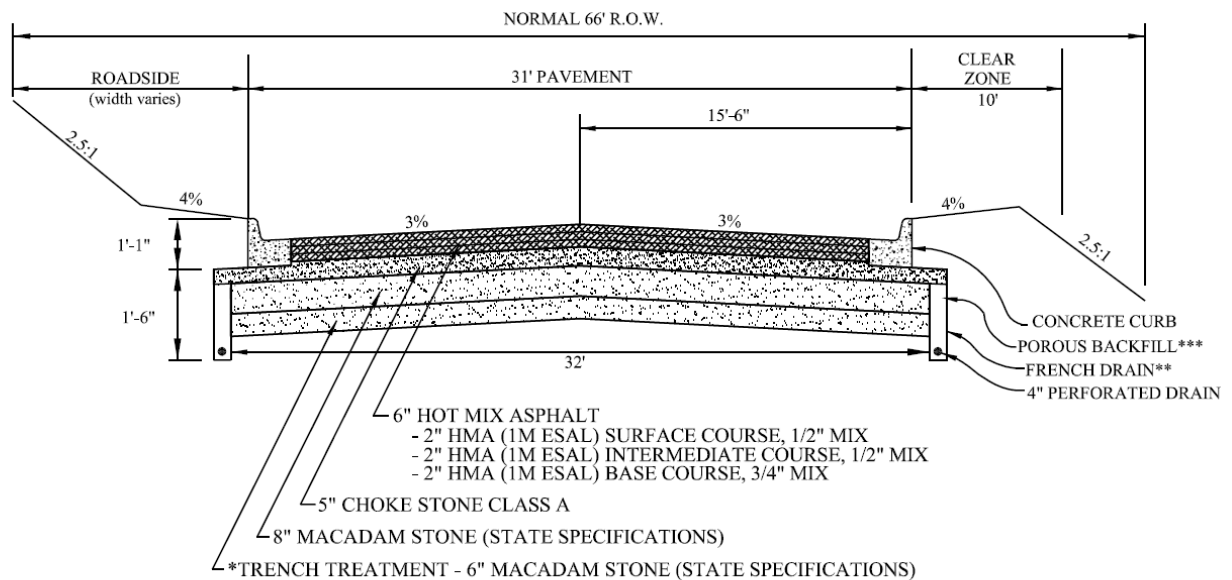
TYPICAL MINIMUM H.M.A. PAVEMENT, MACADAM STONE BASE - CLOSED DITCH SECTION
